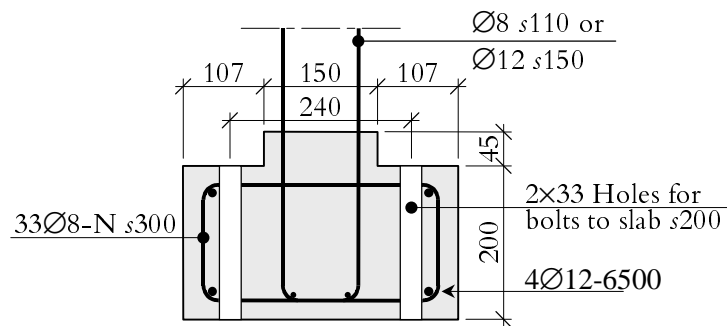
Cross-section of footings: measures and reinforcement. Measures in millimetres.
